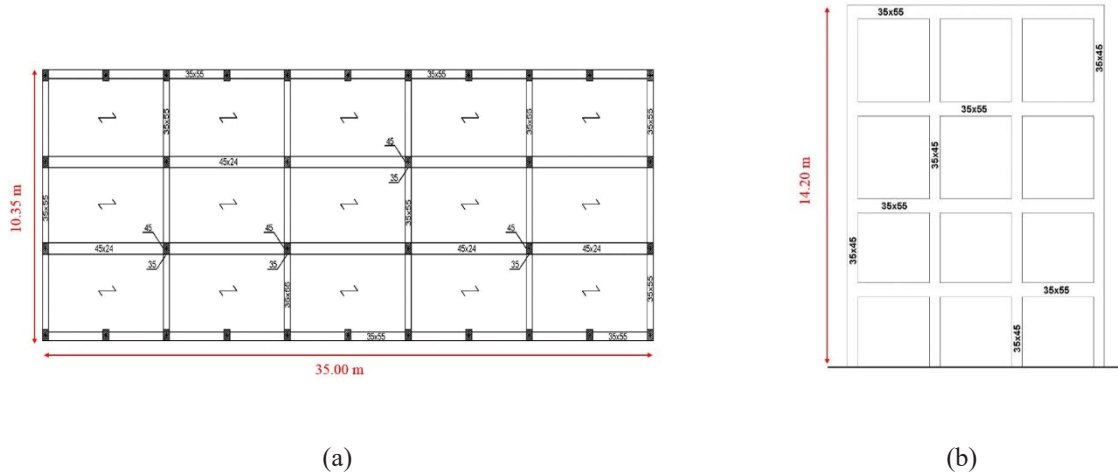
Plan view, rectangular shape (a), bear frame front view, short side (b)
